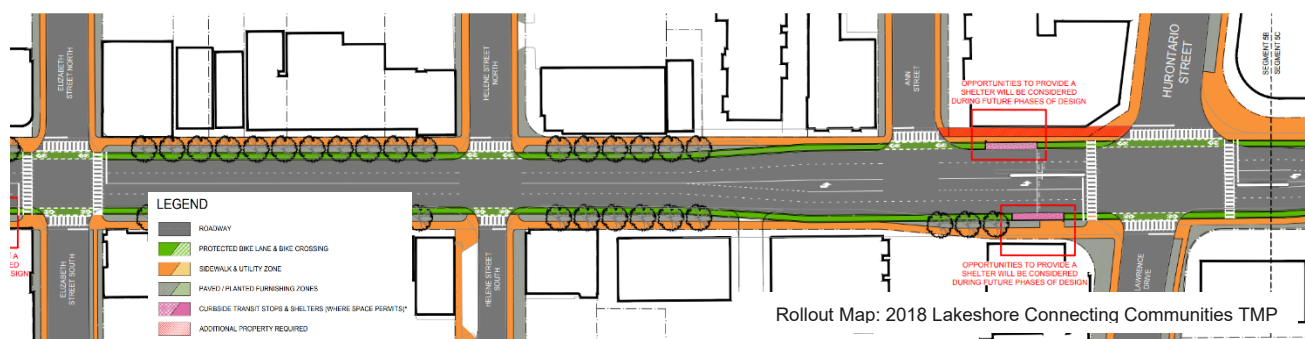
LAKESHORE ROAD EAST ROLL PLAN (LAKESHORE BRT)
